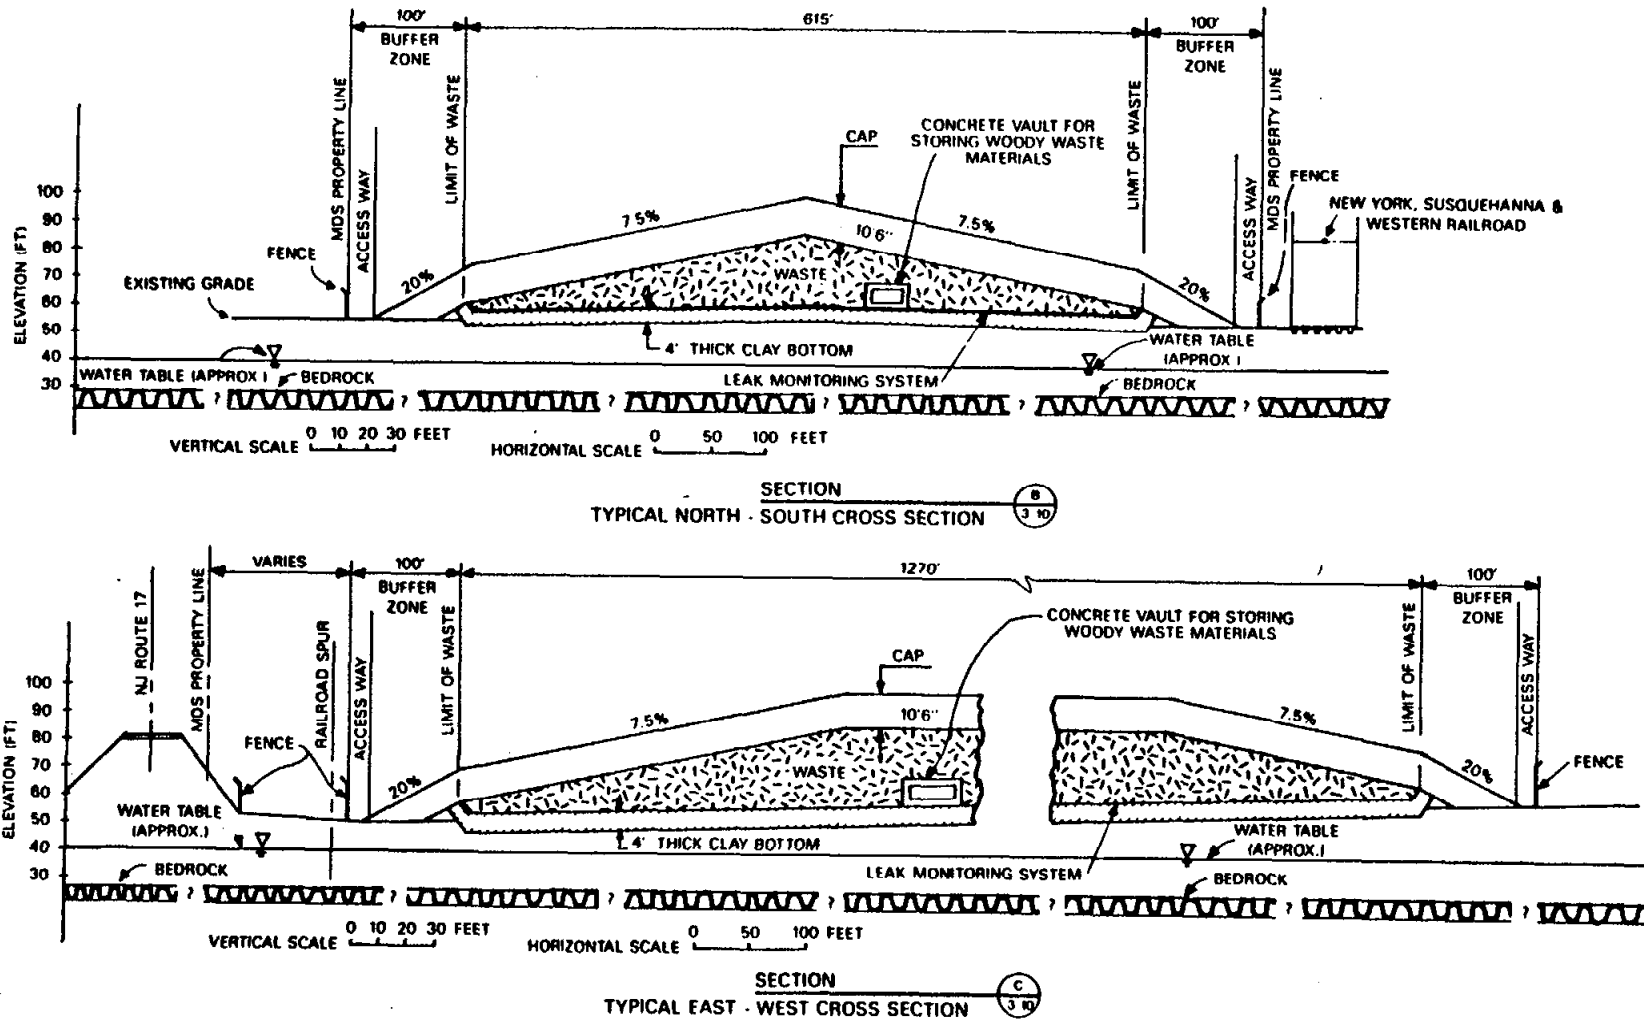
TYPICAL CROSS SECTIONS OF THE COMPLETED MAYWOOD DISPOSAL SITE (ALTERNATIVE 2)
